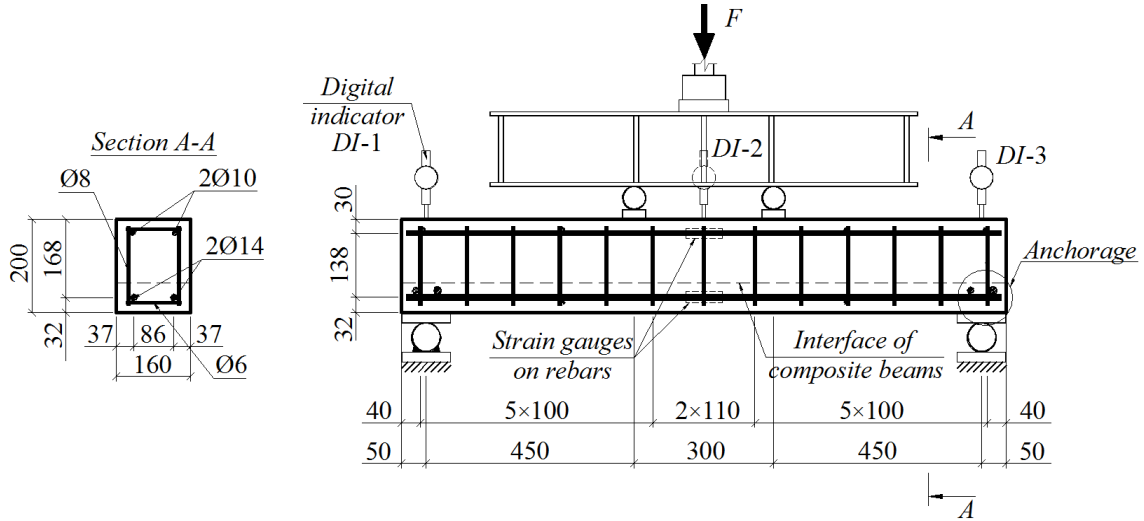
Test setup and details of RC beams and concrete-UHPFRC/RC composite beams
